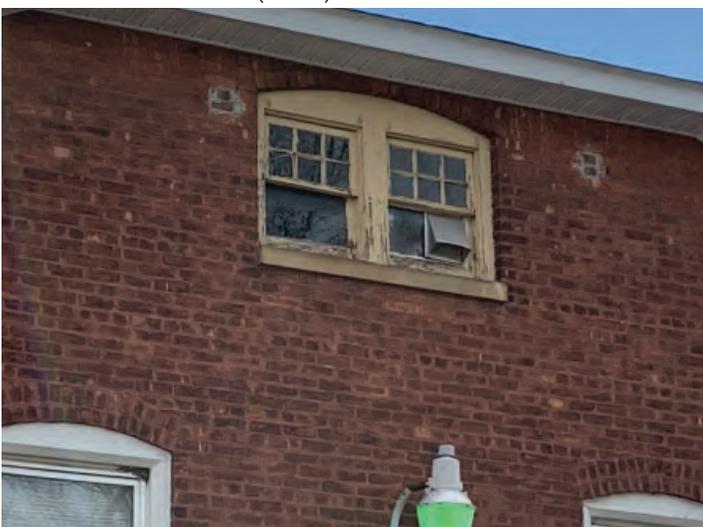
Half-story window at back of 551/553 Franklin Avenue (Lot 26).
